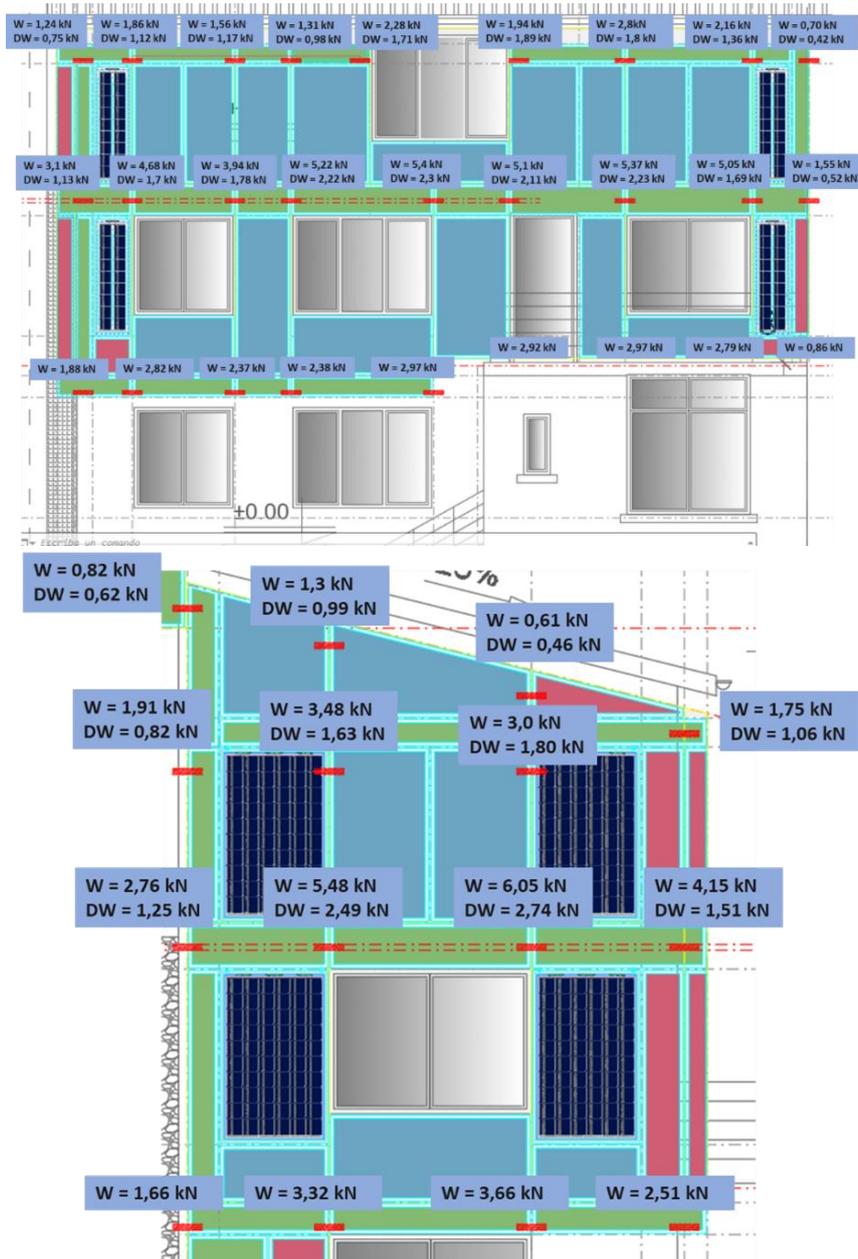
Load on each anchor - south and east façades (Source: ENAR)
